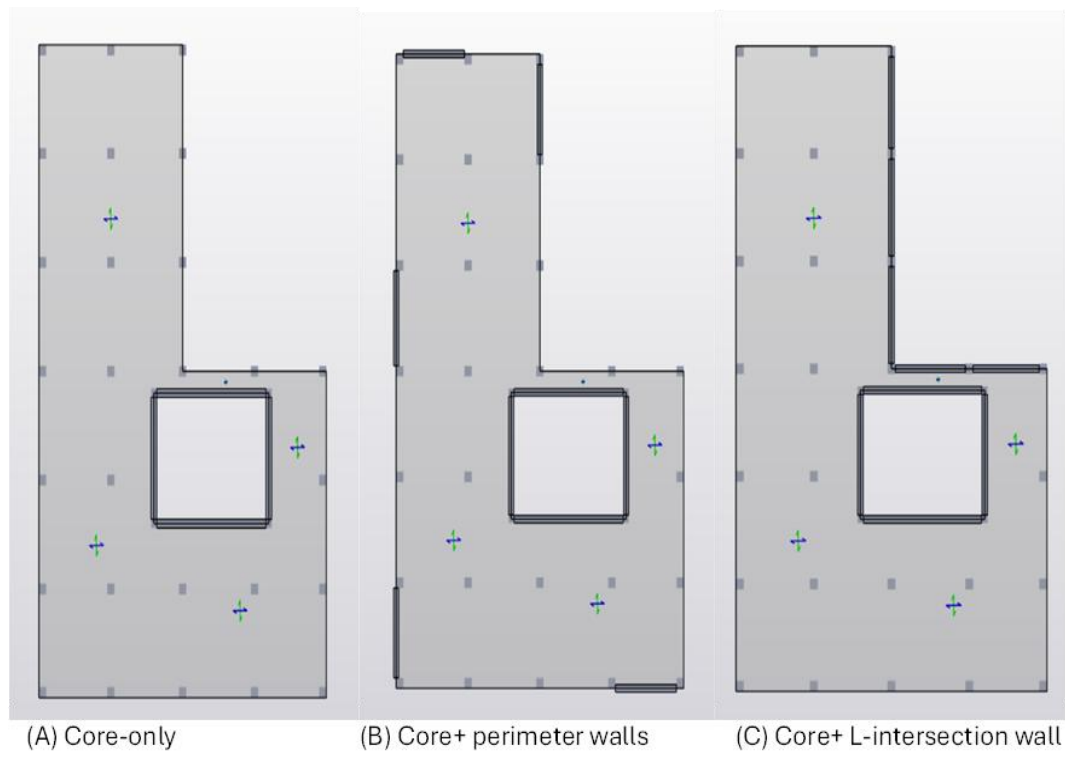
Plan view of the L-shaped building with core, perimeter, and L-wall positions.
